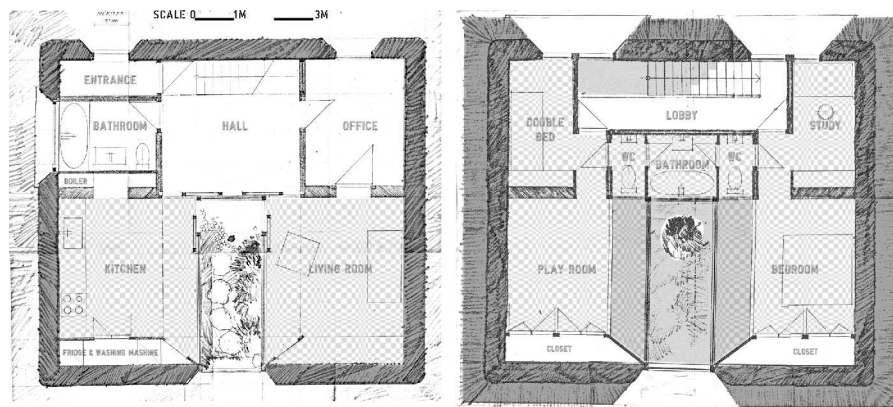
First and second floor plans of the extended primary idea to family home. The checkered area represents the open, heated space. The kitchen, living room and 2nd floor bathroom are directly heated.
